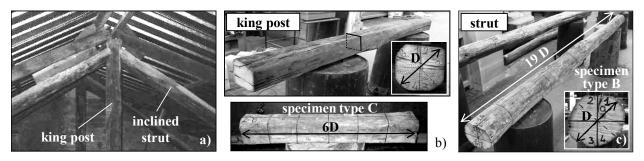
Structural elements: a) Assembled trusses; b) Specimen type C; c) Specimen type B.
